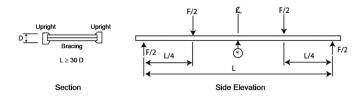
Test arrangement for the major axis bending test on upright sections [10].
